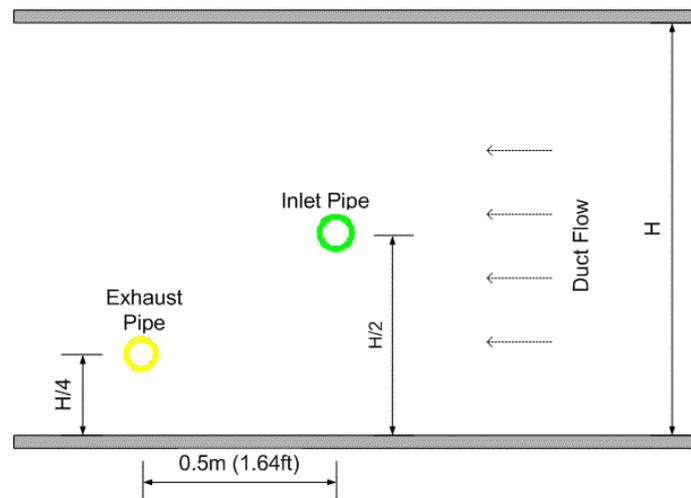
Side view of the inlet and exhaust pipe positions for a small ventilation duct.
